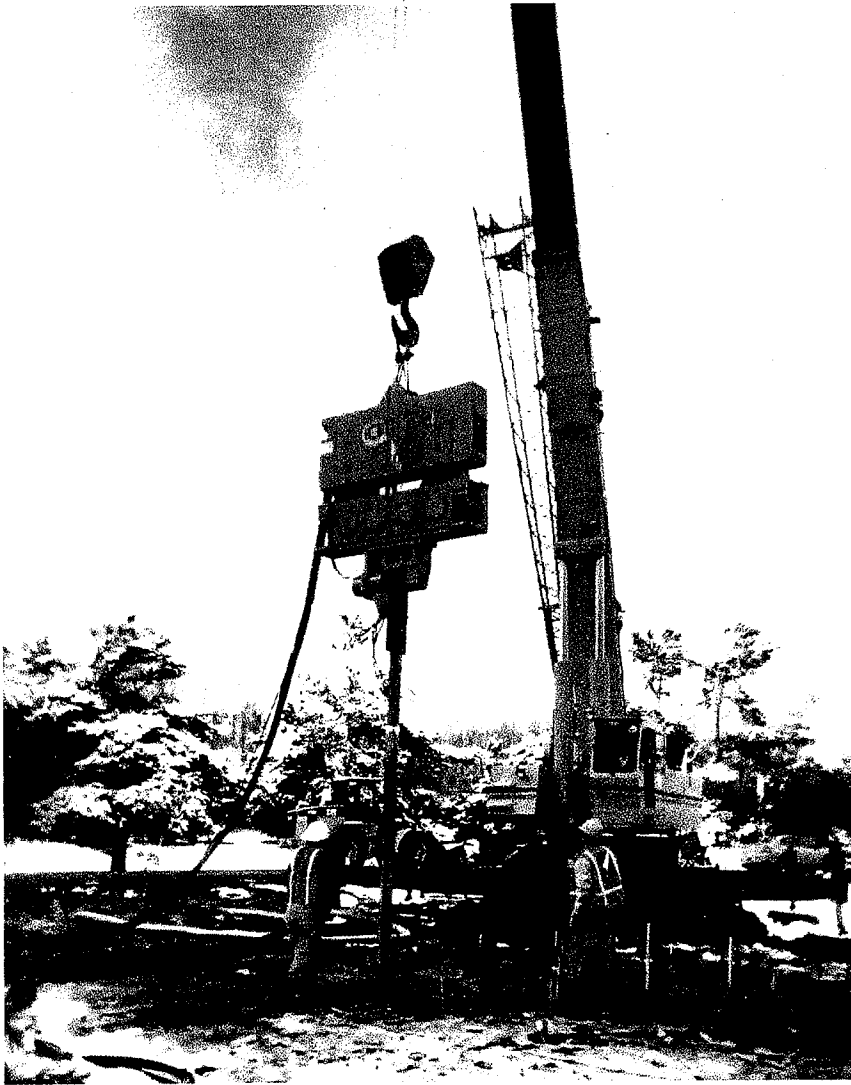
Photo showing installation of EQ Drain using pipe mandrel with vibratory hammer and minimum vibration.
